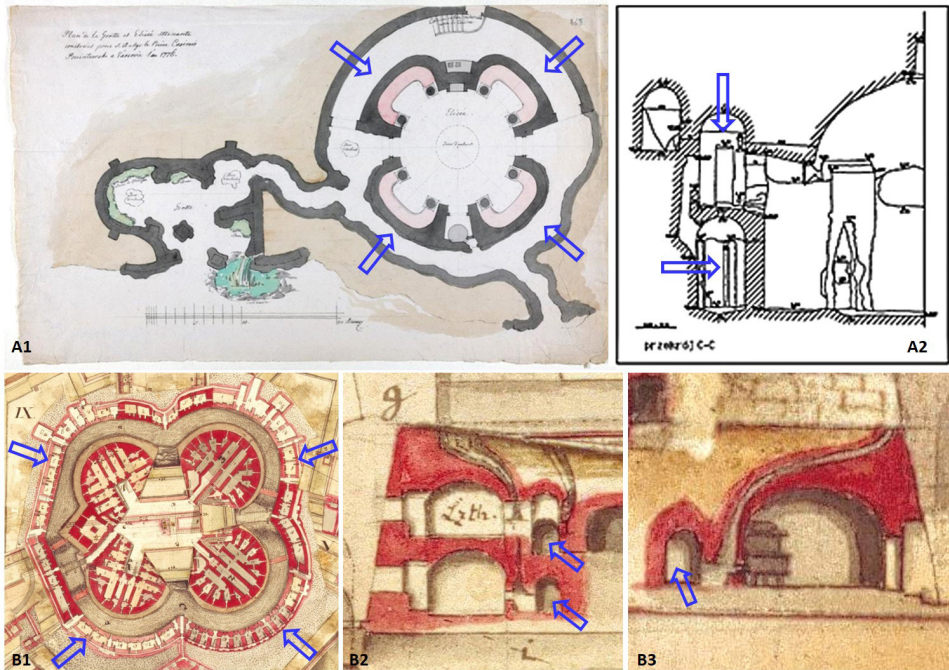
A1 – Elizeum. The third design (...), underground level, 1776-1777 (BUW G.R. 137); A2 – cross-section (inventory); B1 – Srebrna Góra Fortress, central part – the Keep (Donjon), fragment of the plan from 1776 (GStA PK G 70032); B2 and B3 – cross-sections, fragments of the plan as above, Perimeter corridors marked with arrows
